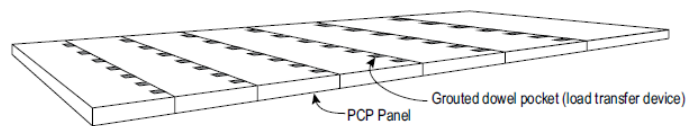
Multiple adjacent PCP panels can be used for full-scale reconstruction of jointed pavements
